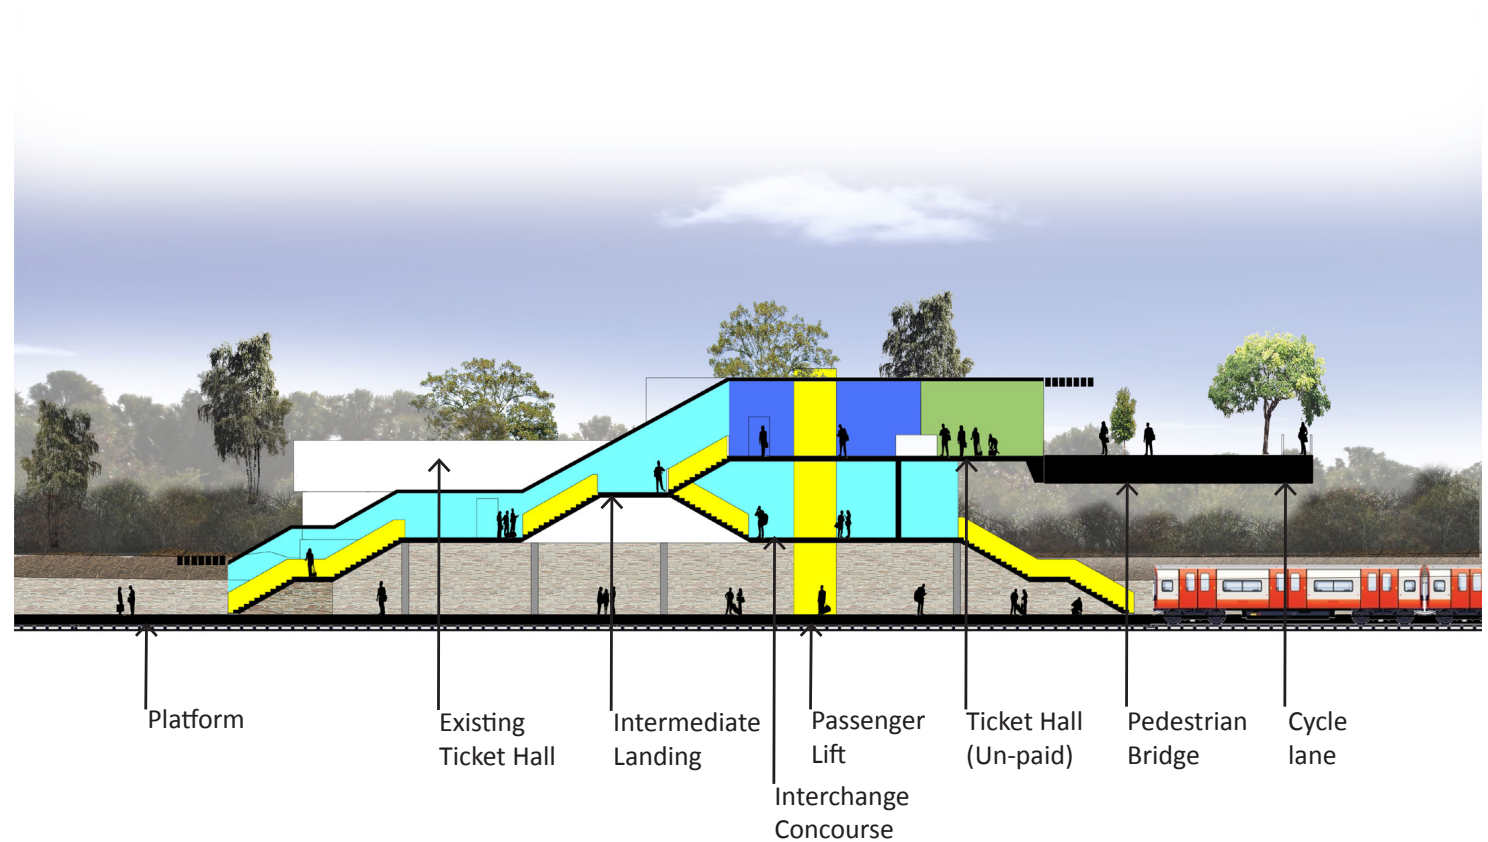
Option 1.4 - Cross section - view from the north facing south
